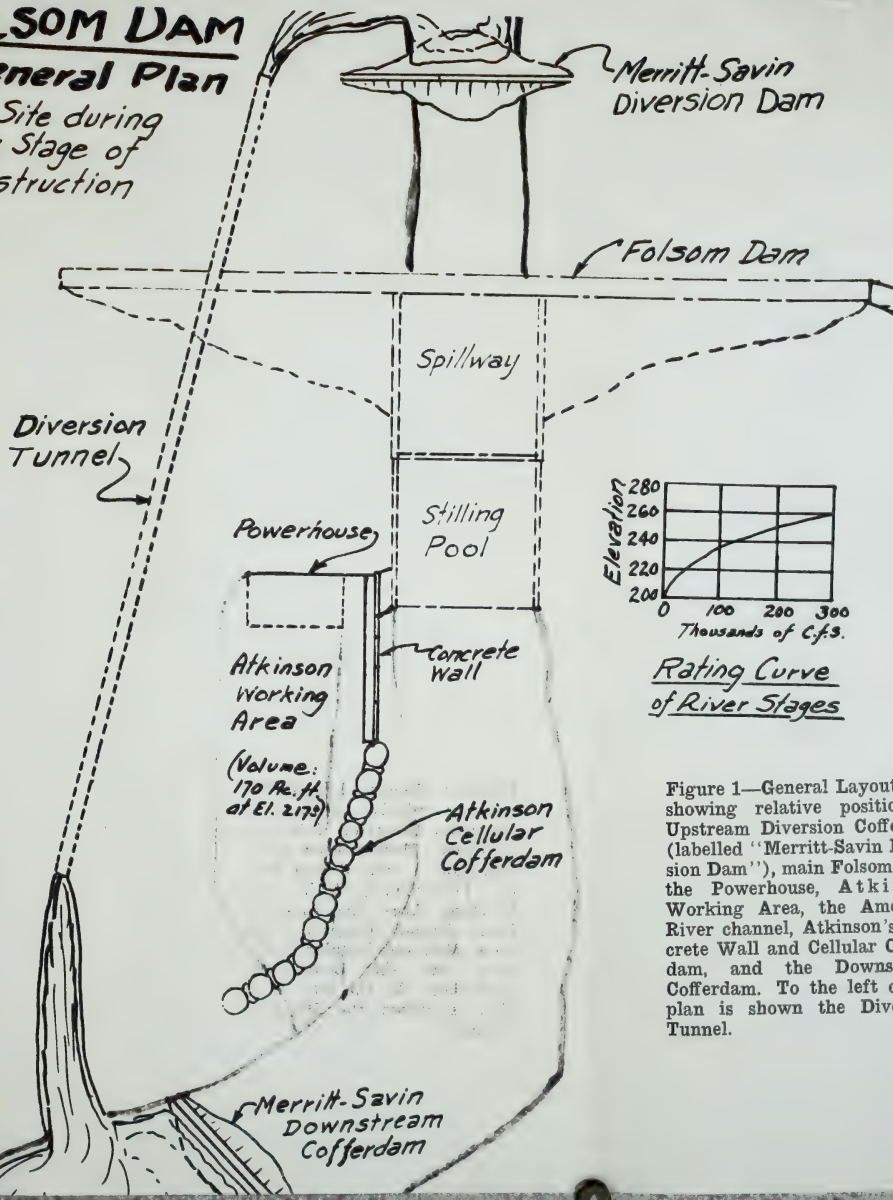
General Layout Plan showing relative position of Upstream Diversion Cofferdam (labelled "Merritt-Savin Diversion Dam"), main Folsom Dam, the Powerhouse, Atkinson Working Area, the American River channel, Atkinson's Concrete Wall and Cellular Cofferdam, and the Downstream Cofferdam. To the left of the plan is shown the Diversion Tunnel.
